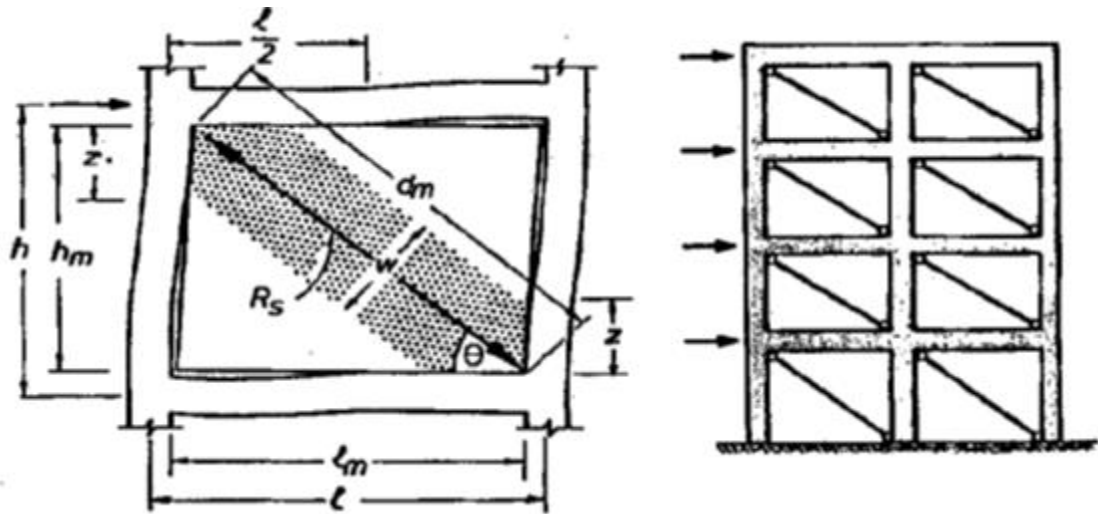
and 2.4, Equivalent bracing action of masonry infill [Paulay and Priestley]¹
